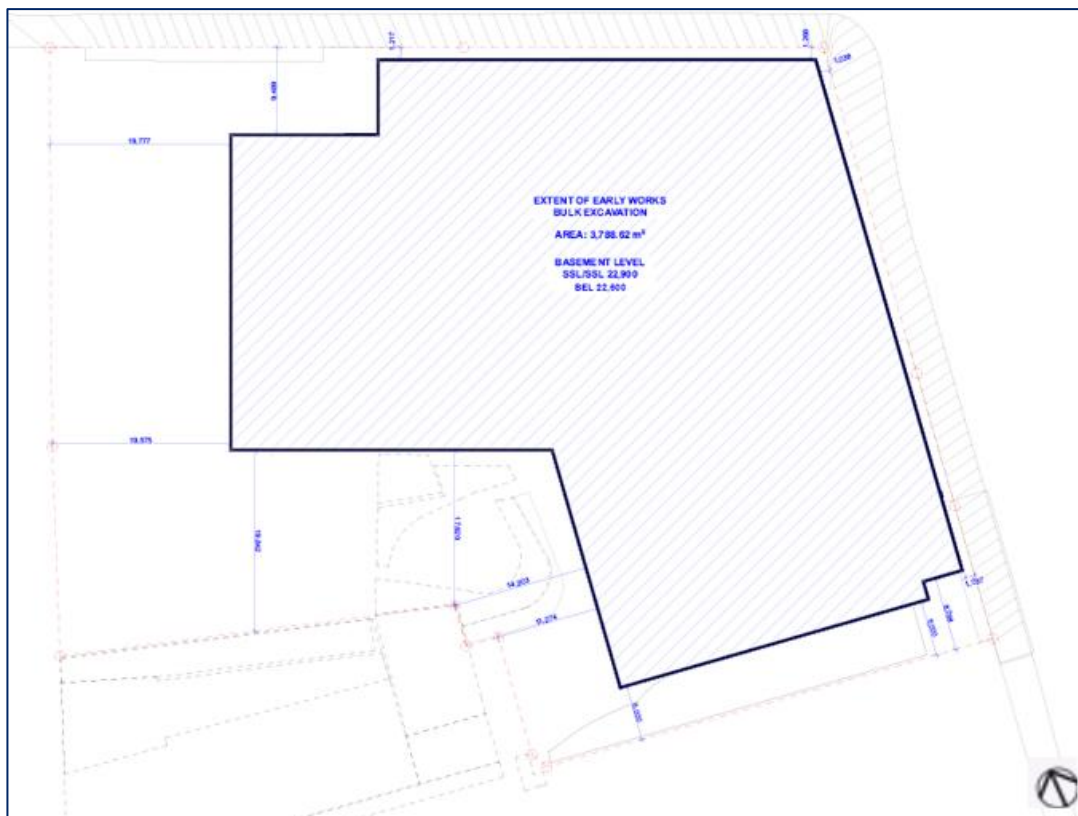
I Proposed additional basement level excavation (Source: EIS)
